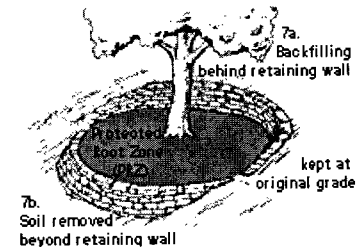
If you change the grade within the root zone, use retaining walls to keep as much of the original grade as possible. a) backfilling; b) cutting.
